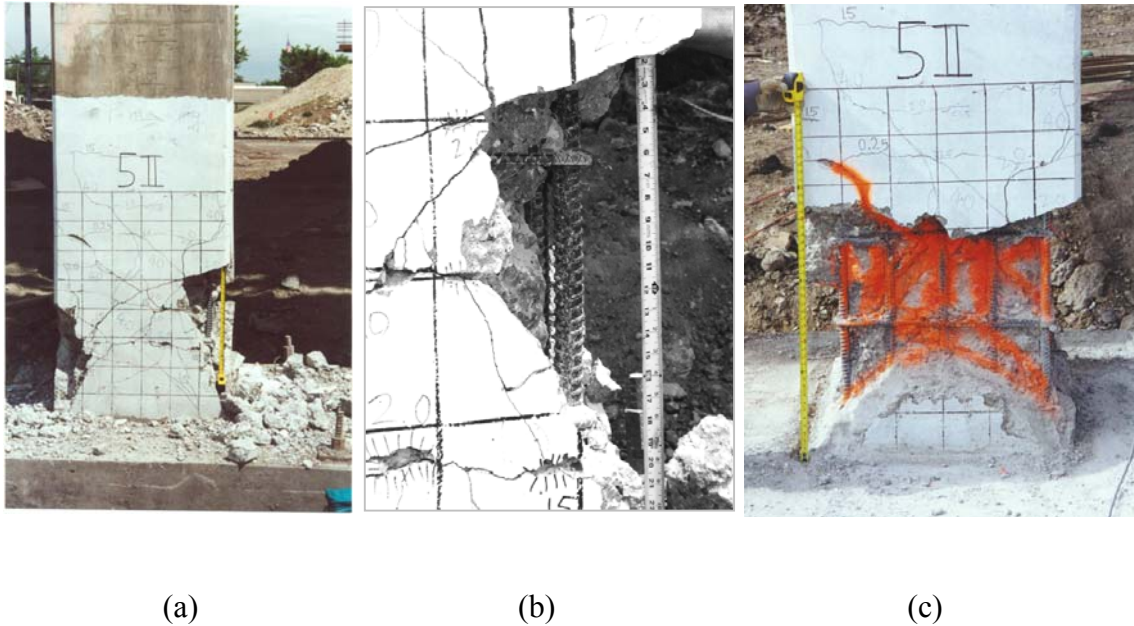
Damage to Bent #5S (2000) lap splice at bottom of center column: (a) after test, (b) detail showing buckled column bar, (c) lap splice after post-test investigation
